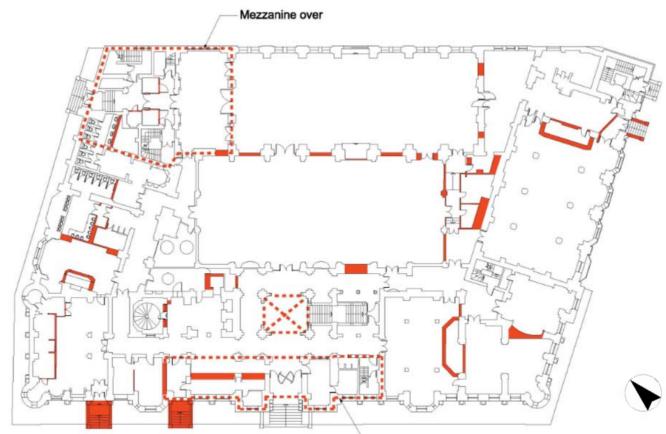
Hotel Russell - Original Ground Floor Plan with later additions indicated in orange.
